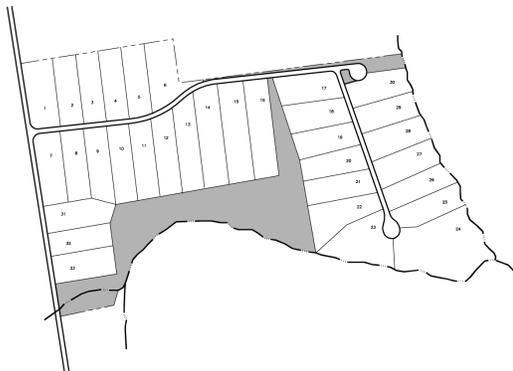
24: Conservation Subdivision Design Examples
